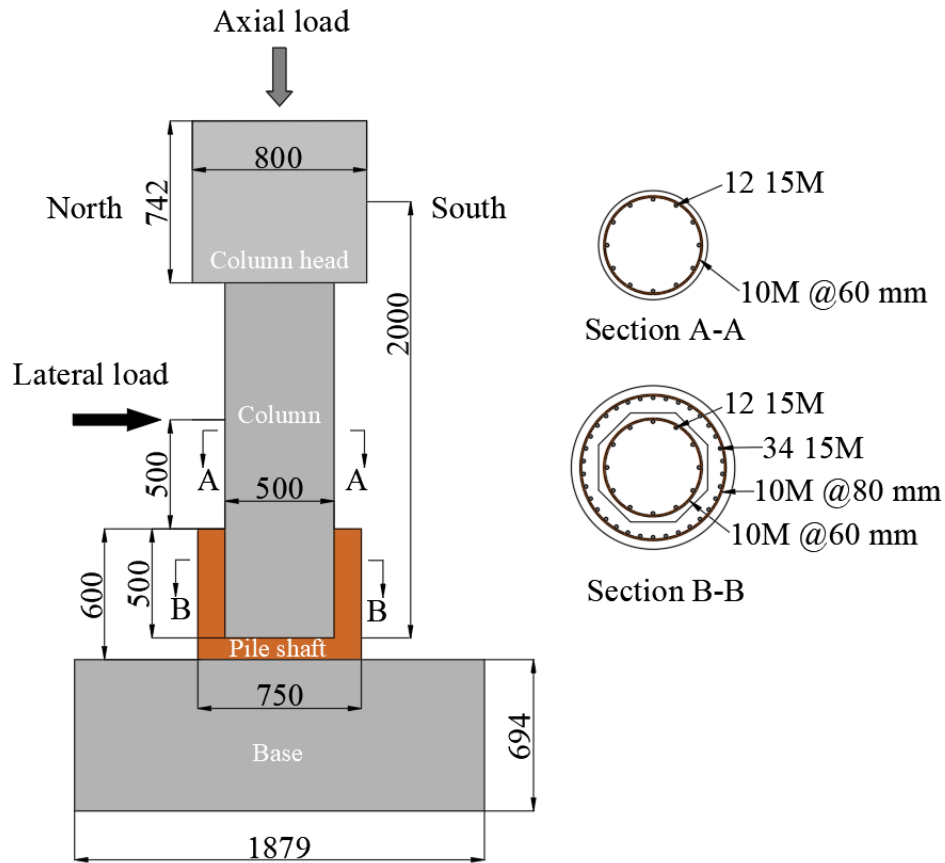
Specimen design and reinforcement details (Unit: mm)
